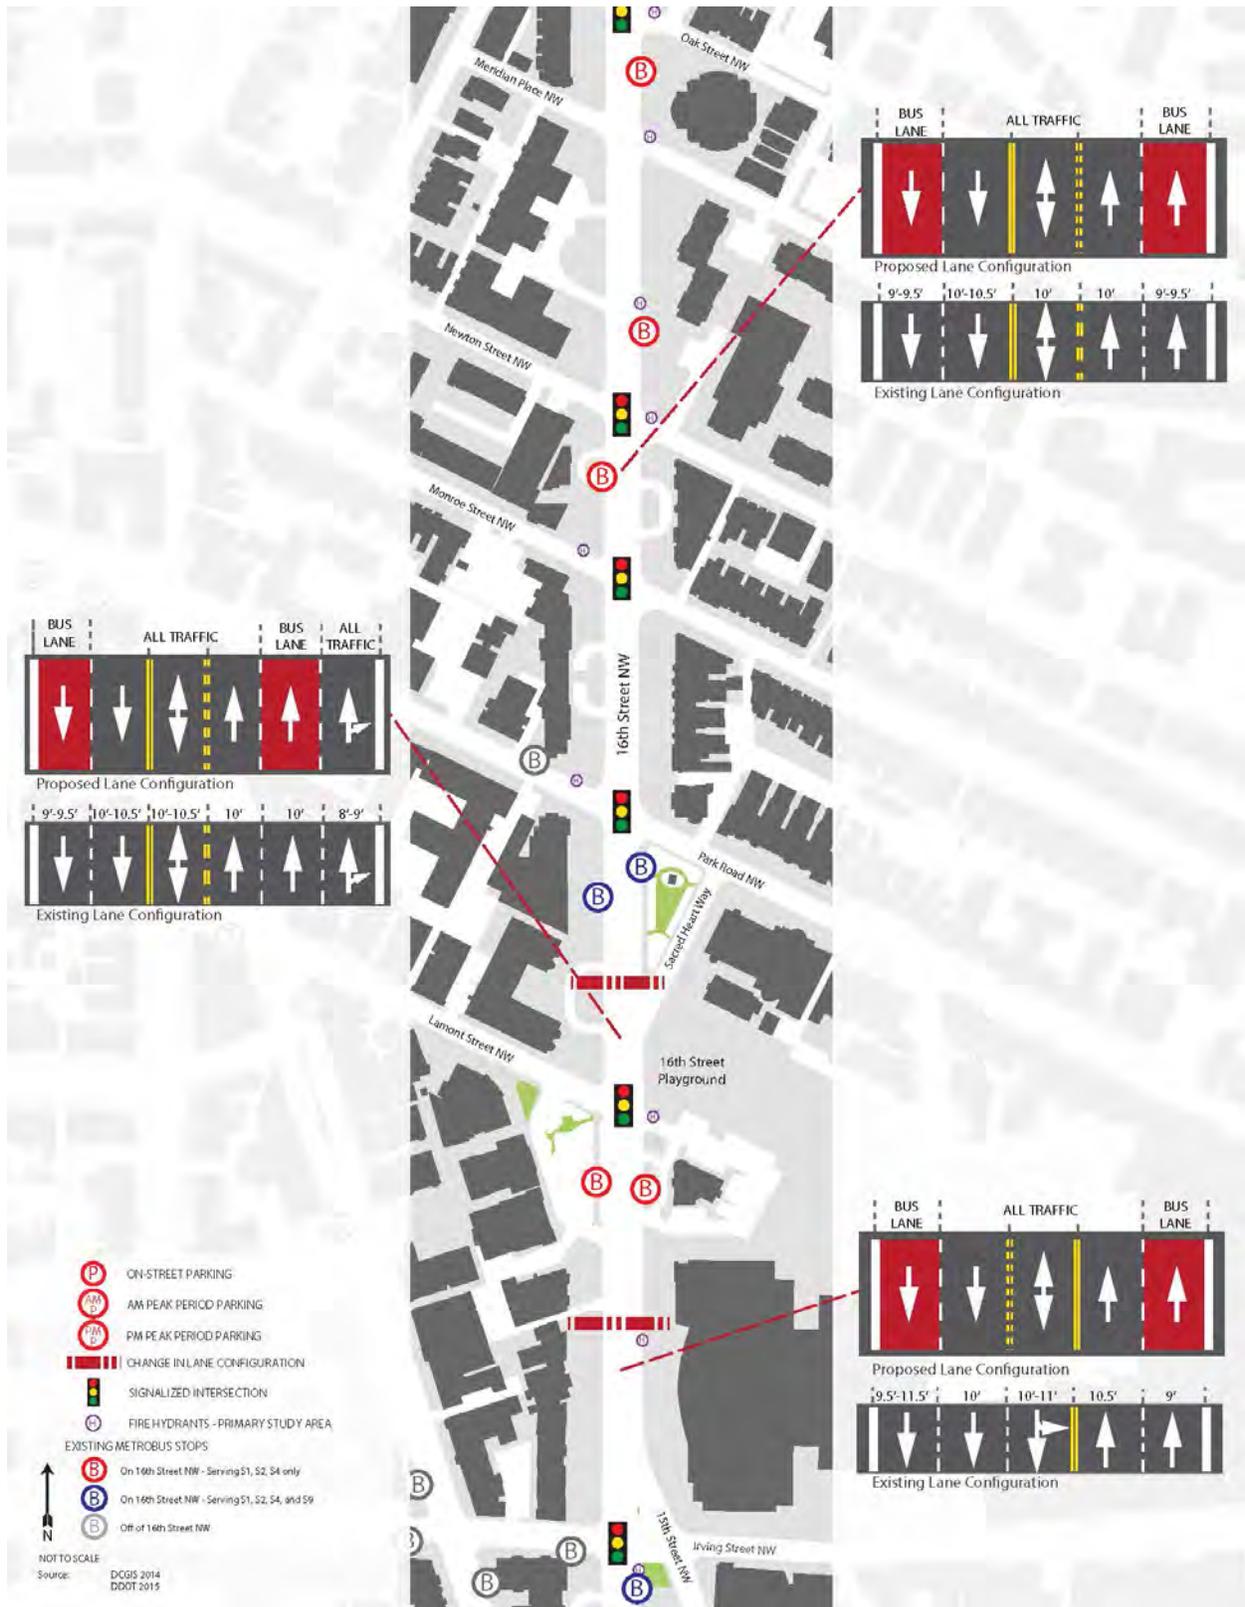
Alternative 2 Lane Configuration – Irving Street NW to Kalorama Road NW- 7 AM to 10 PM
